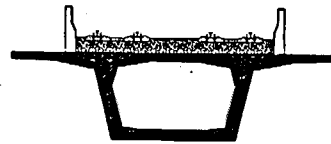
Cross Section with 1,2m Walls (Ballast)
